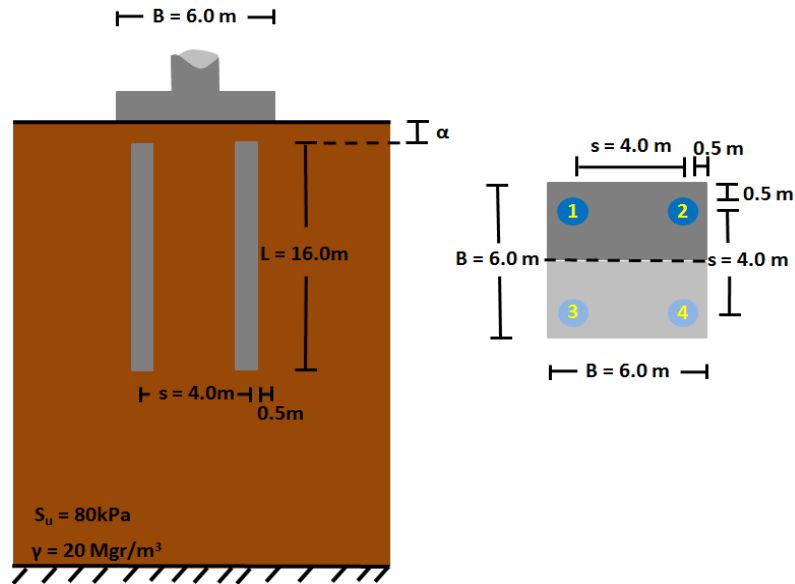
Section and plan view of the first unconnected pile foundation tested.
